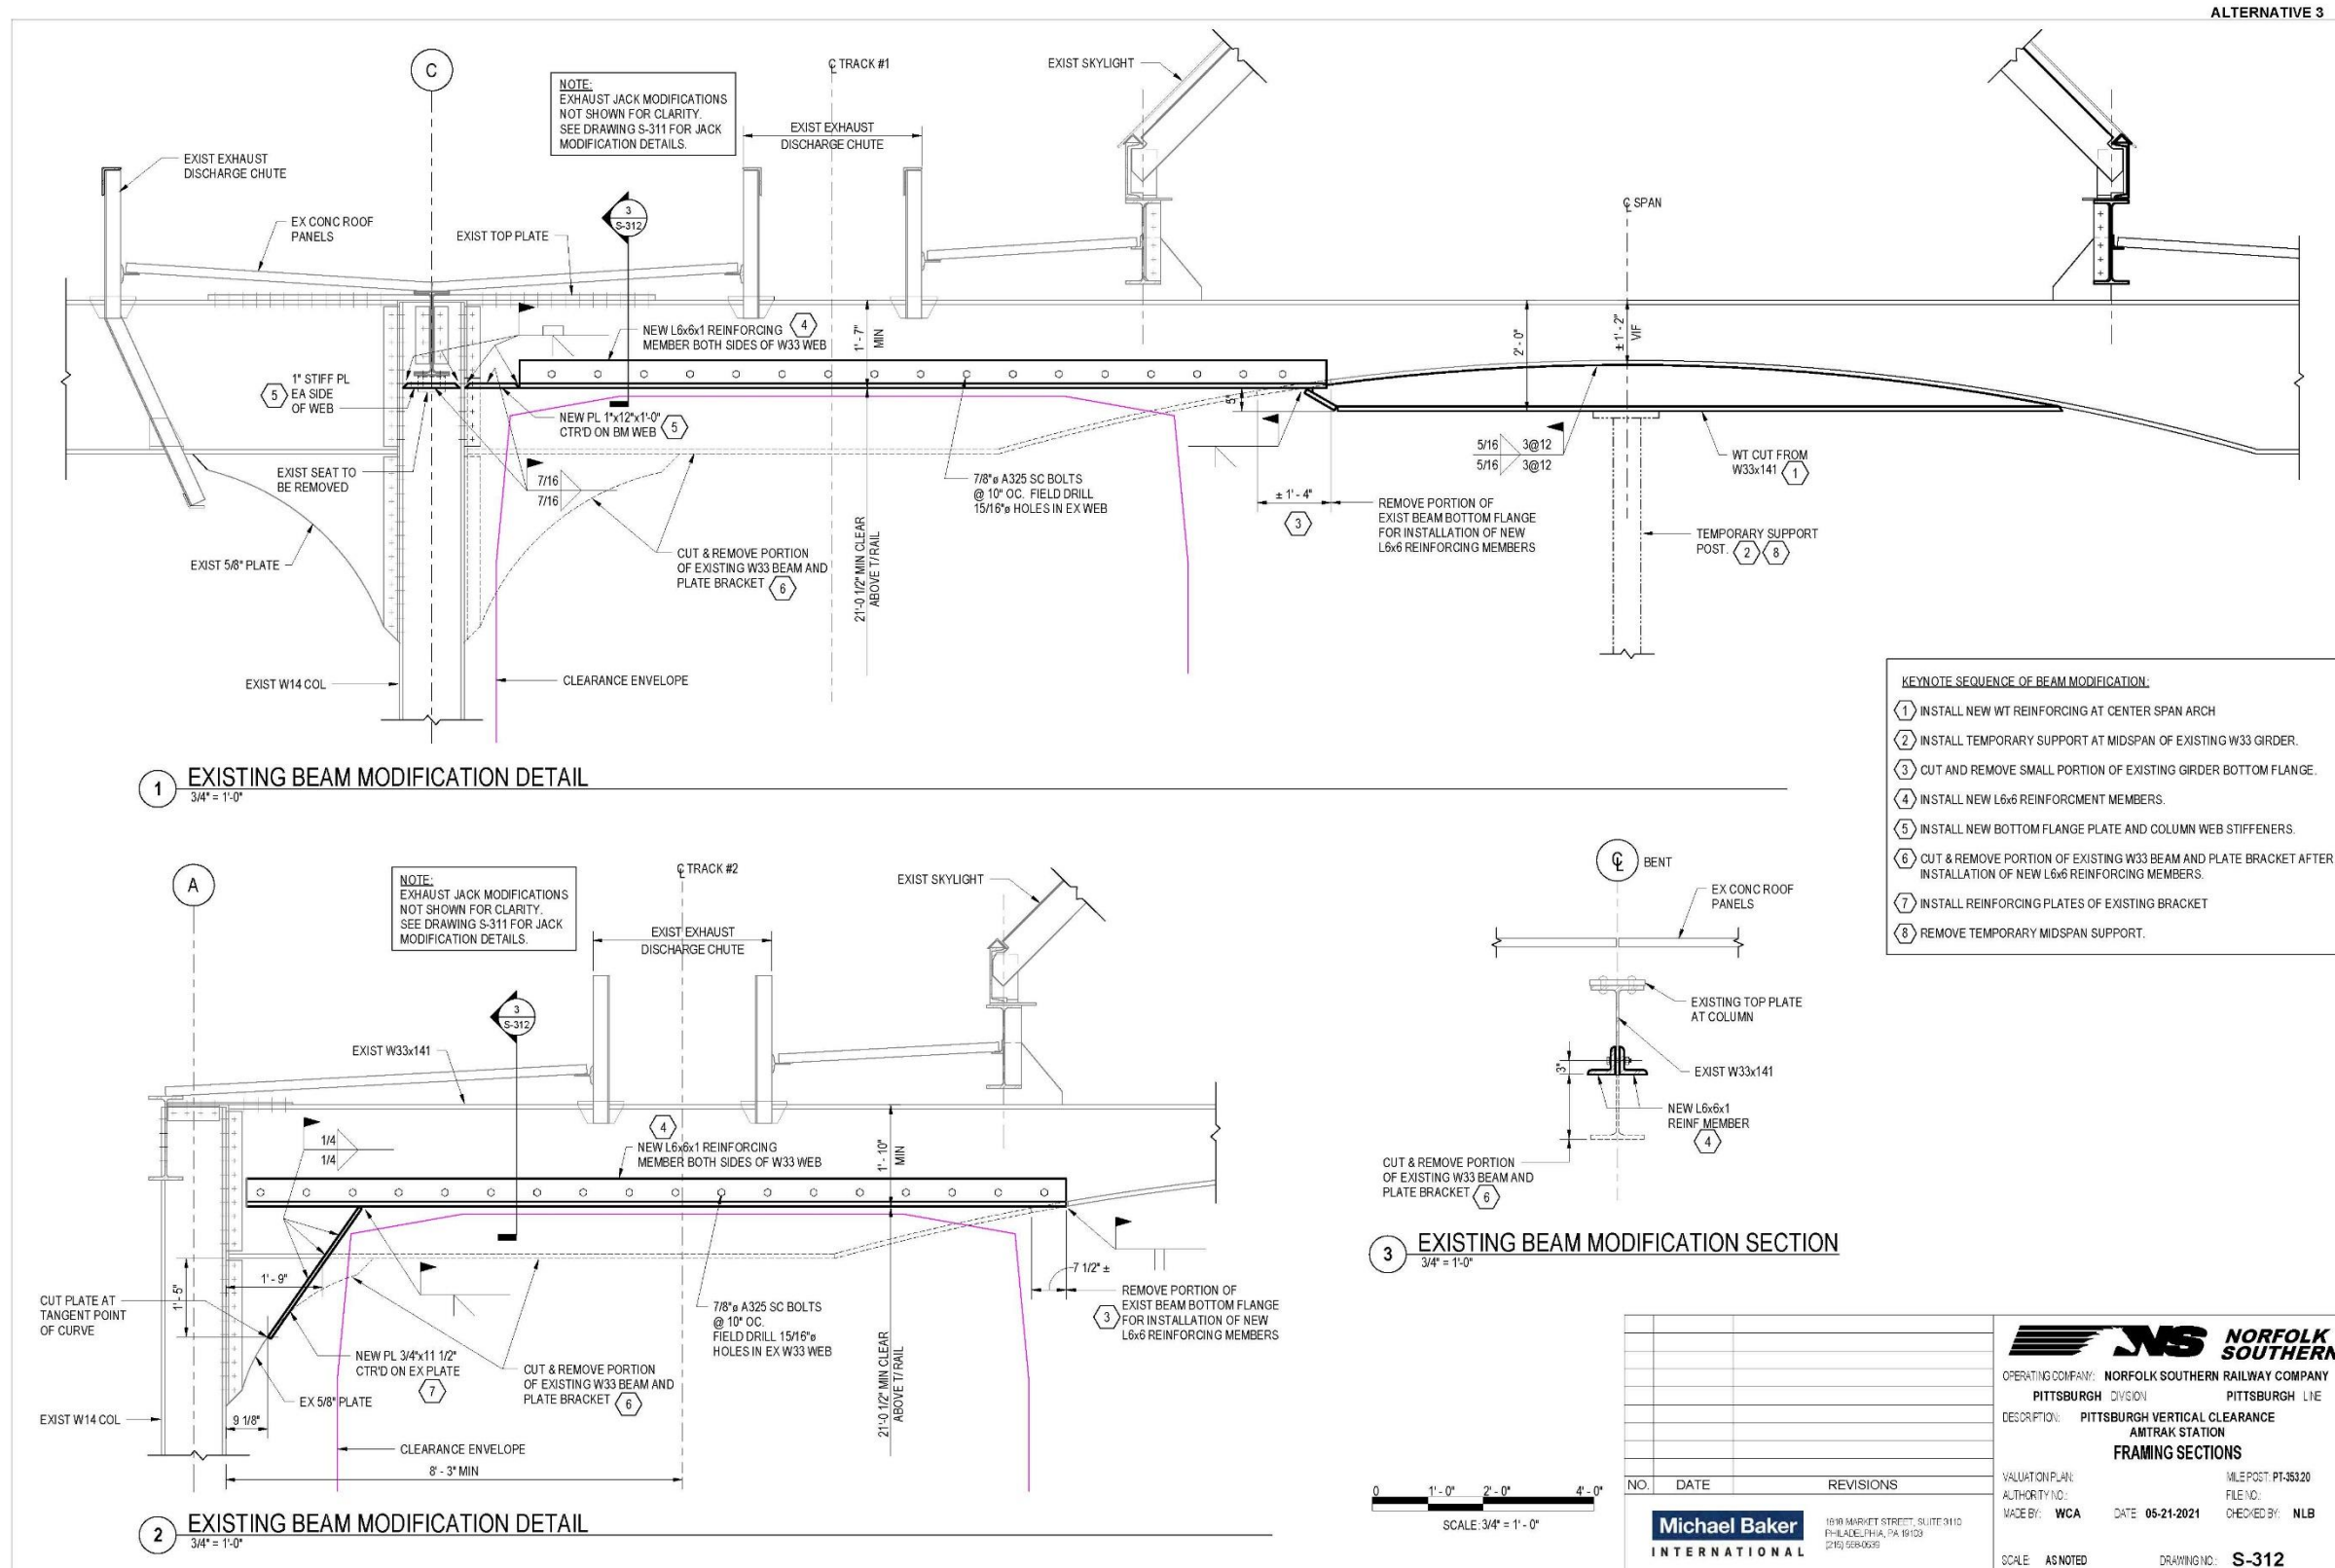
Plan sheet showing modifications to beams over tracks 1 and 2.
